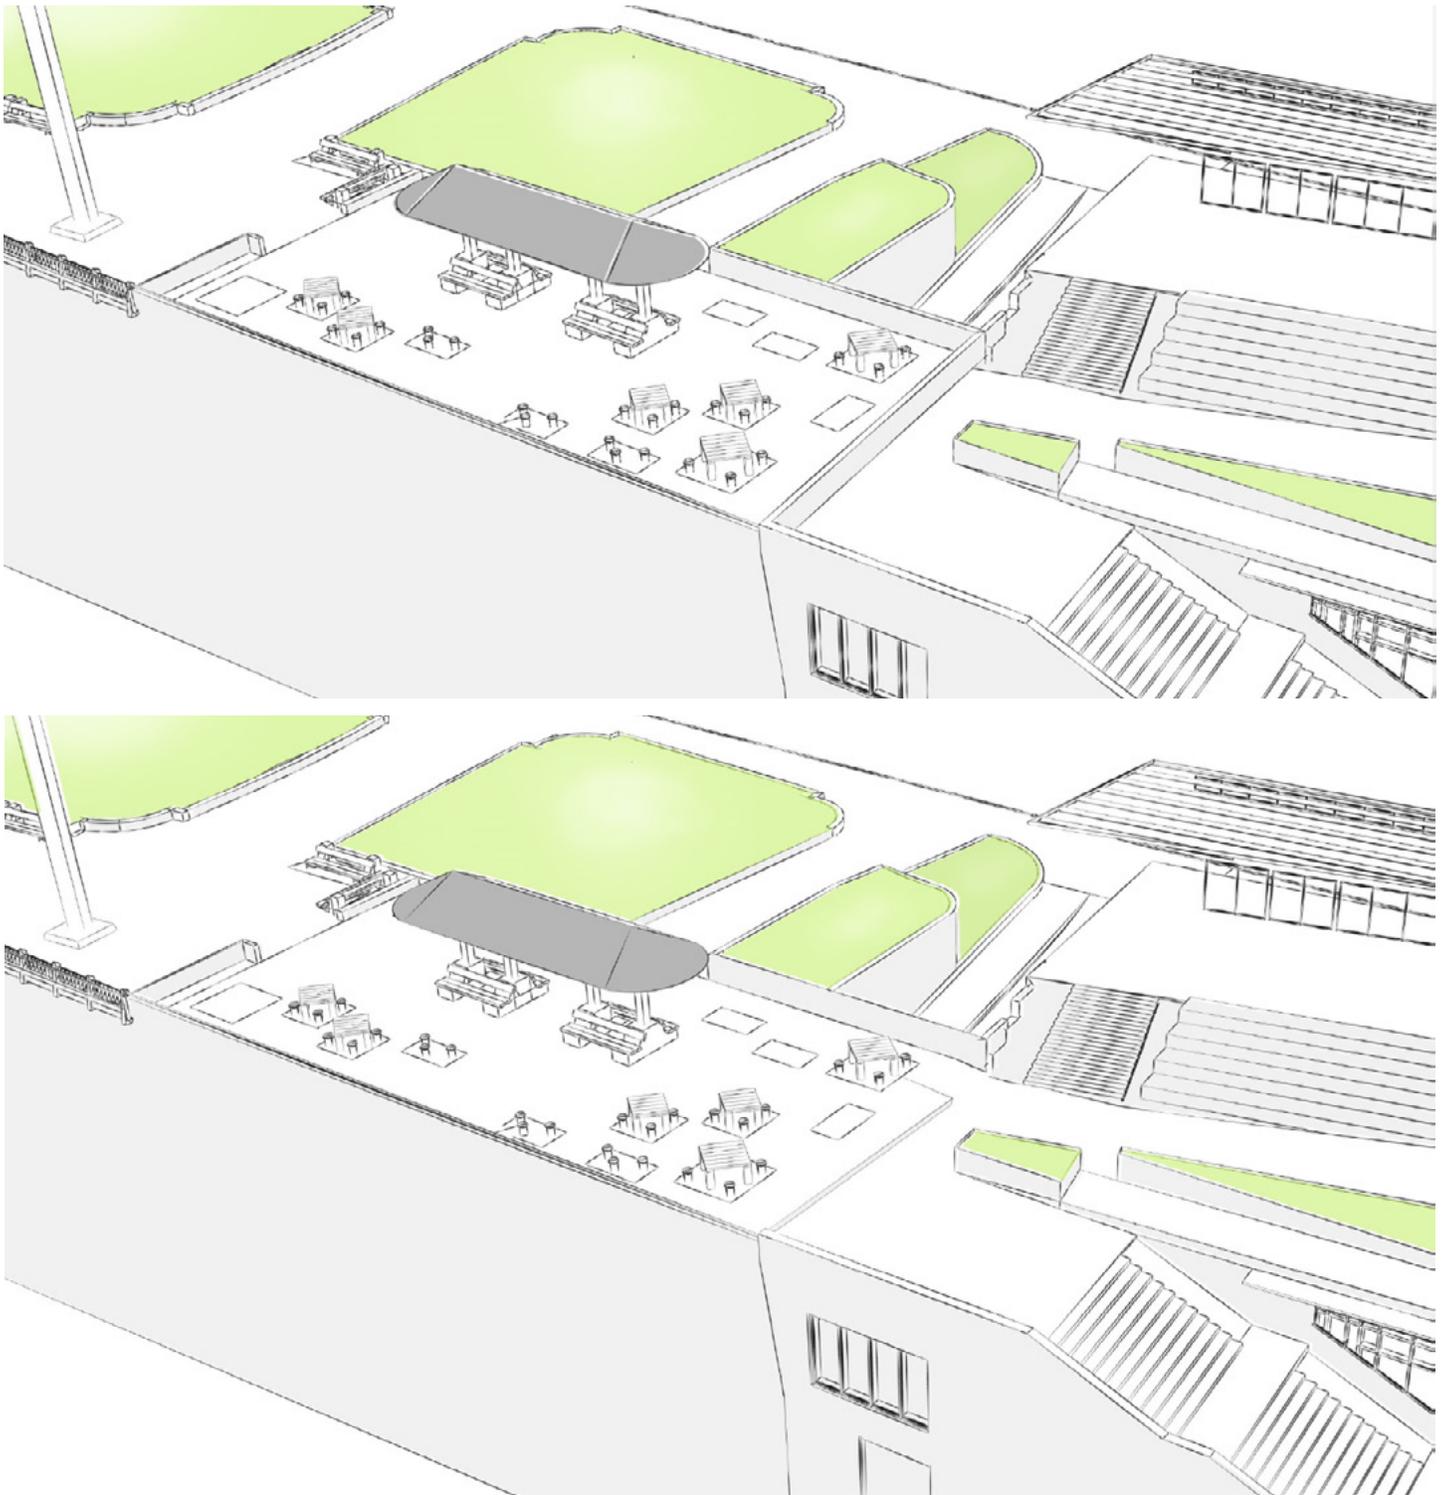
Proposed connection without connection to park (above) and with connection to park (below)
